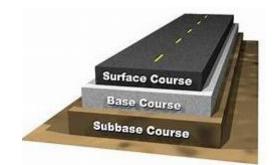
Arrangement of Highway Flexible Pavement Layers Source: AASHTO [8]
